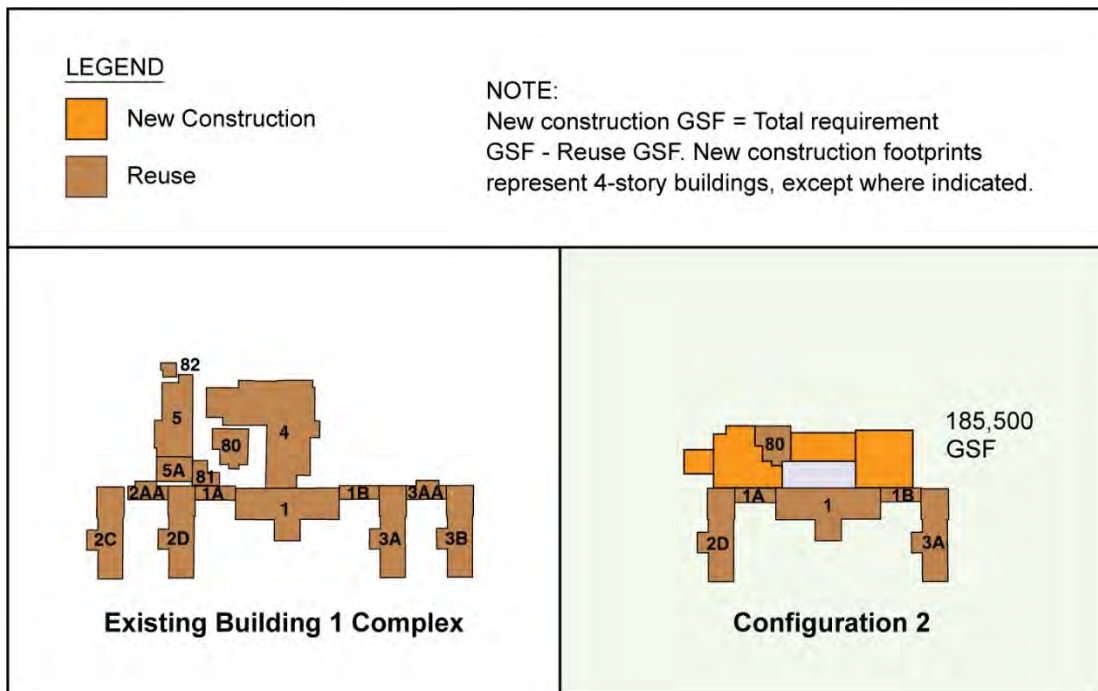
The Proposed Action (Configuration 2) would reuse historic hospital wings while constructing new operations centers on the north side of the Building 1 Complex.
